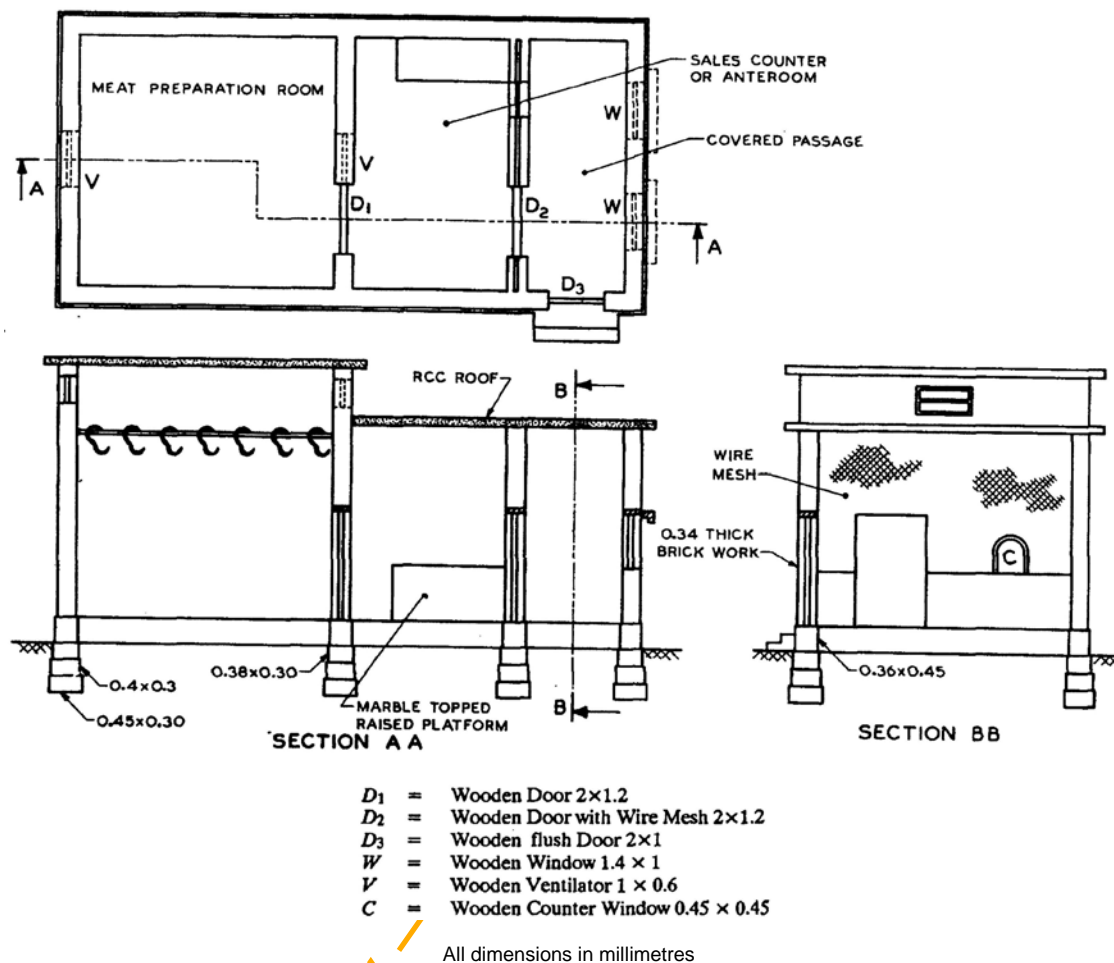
Typical layout of meat stalls for the sale of meat of small and large animals
